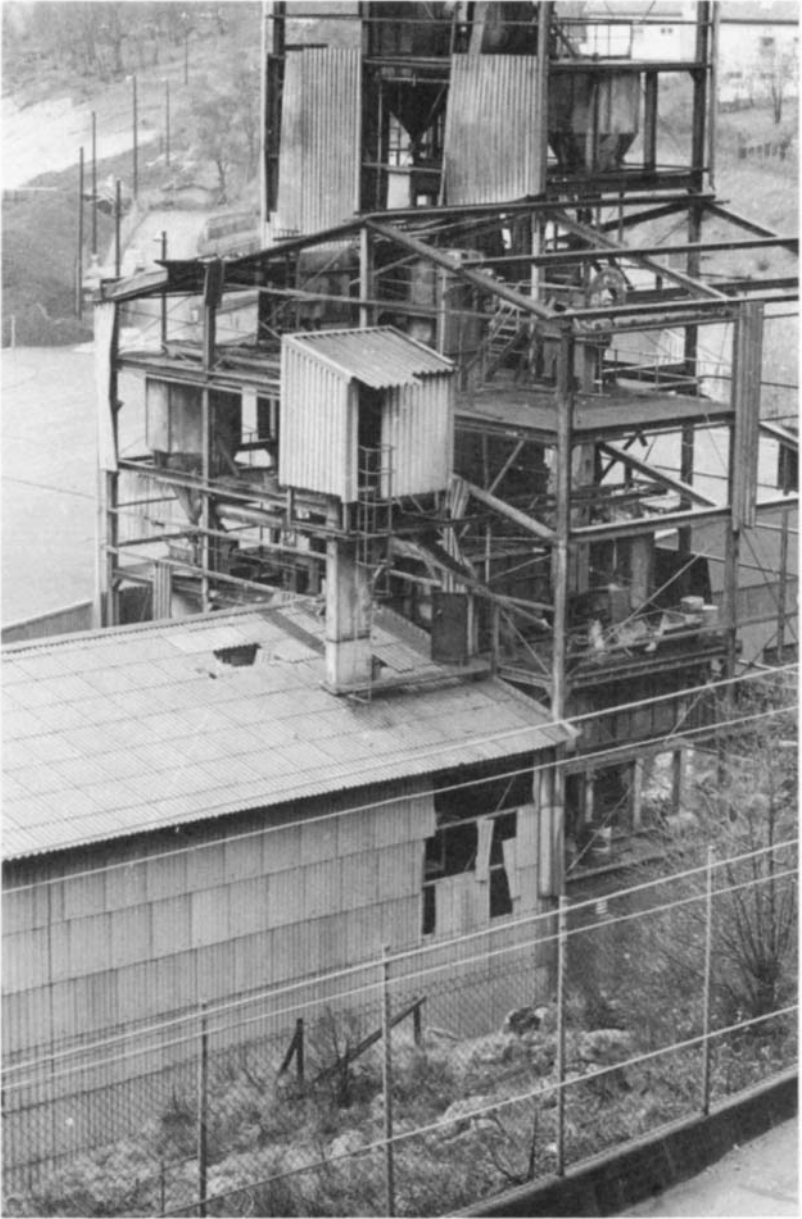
View of the extensive demolition of the silicon grinding plant caused by the silicon dust explosion at Bremanger, Norway, October 1972.
